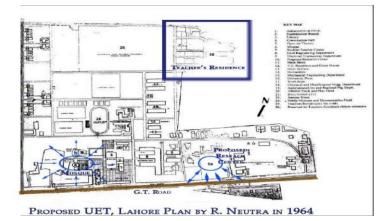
Proposed plan by R. Neutra for the University of Engineering and Technology, Lahore. Source: Building and Works Dept., UET,
